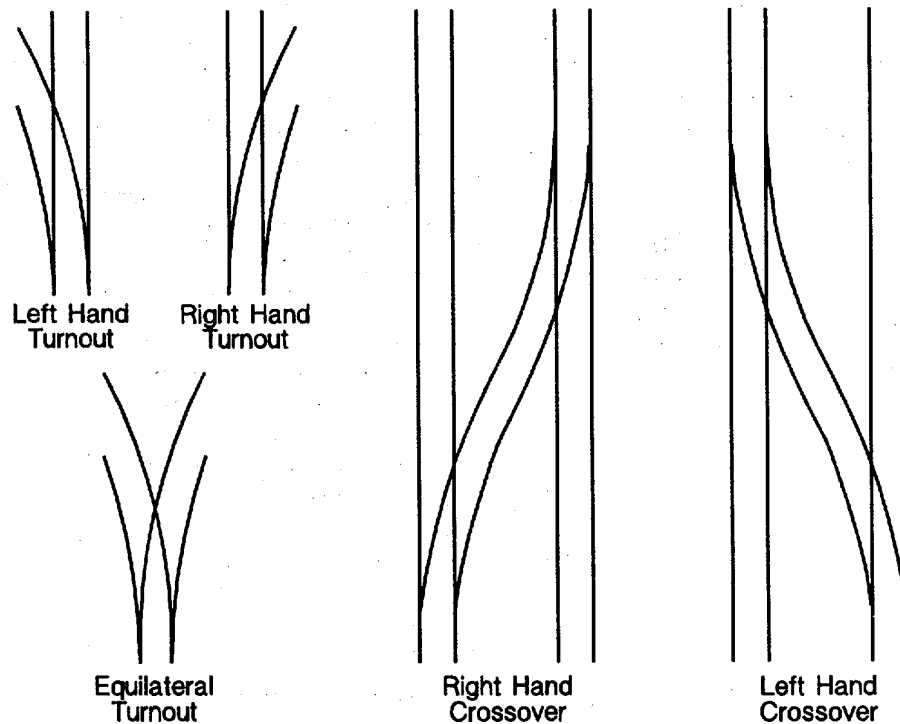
General Arrangement of Turnouts and Crossovers.
